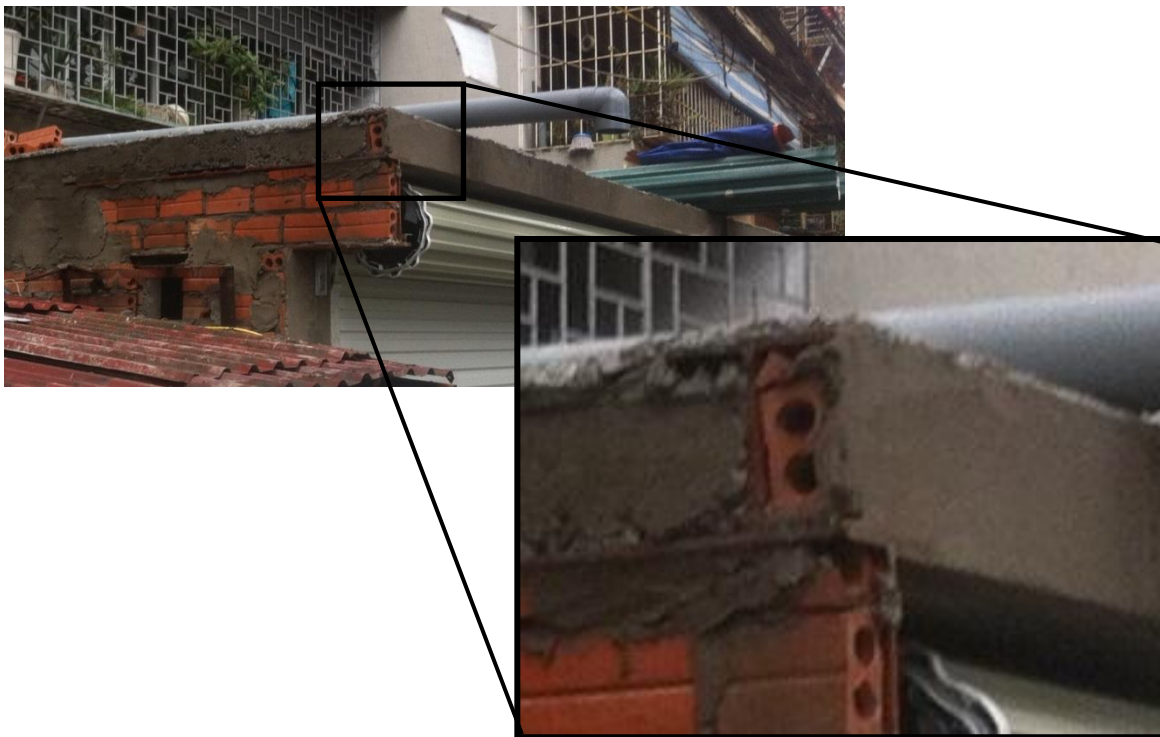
TYPICAL BUILT WALL OF A VIETNAMESE HOUSE
